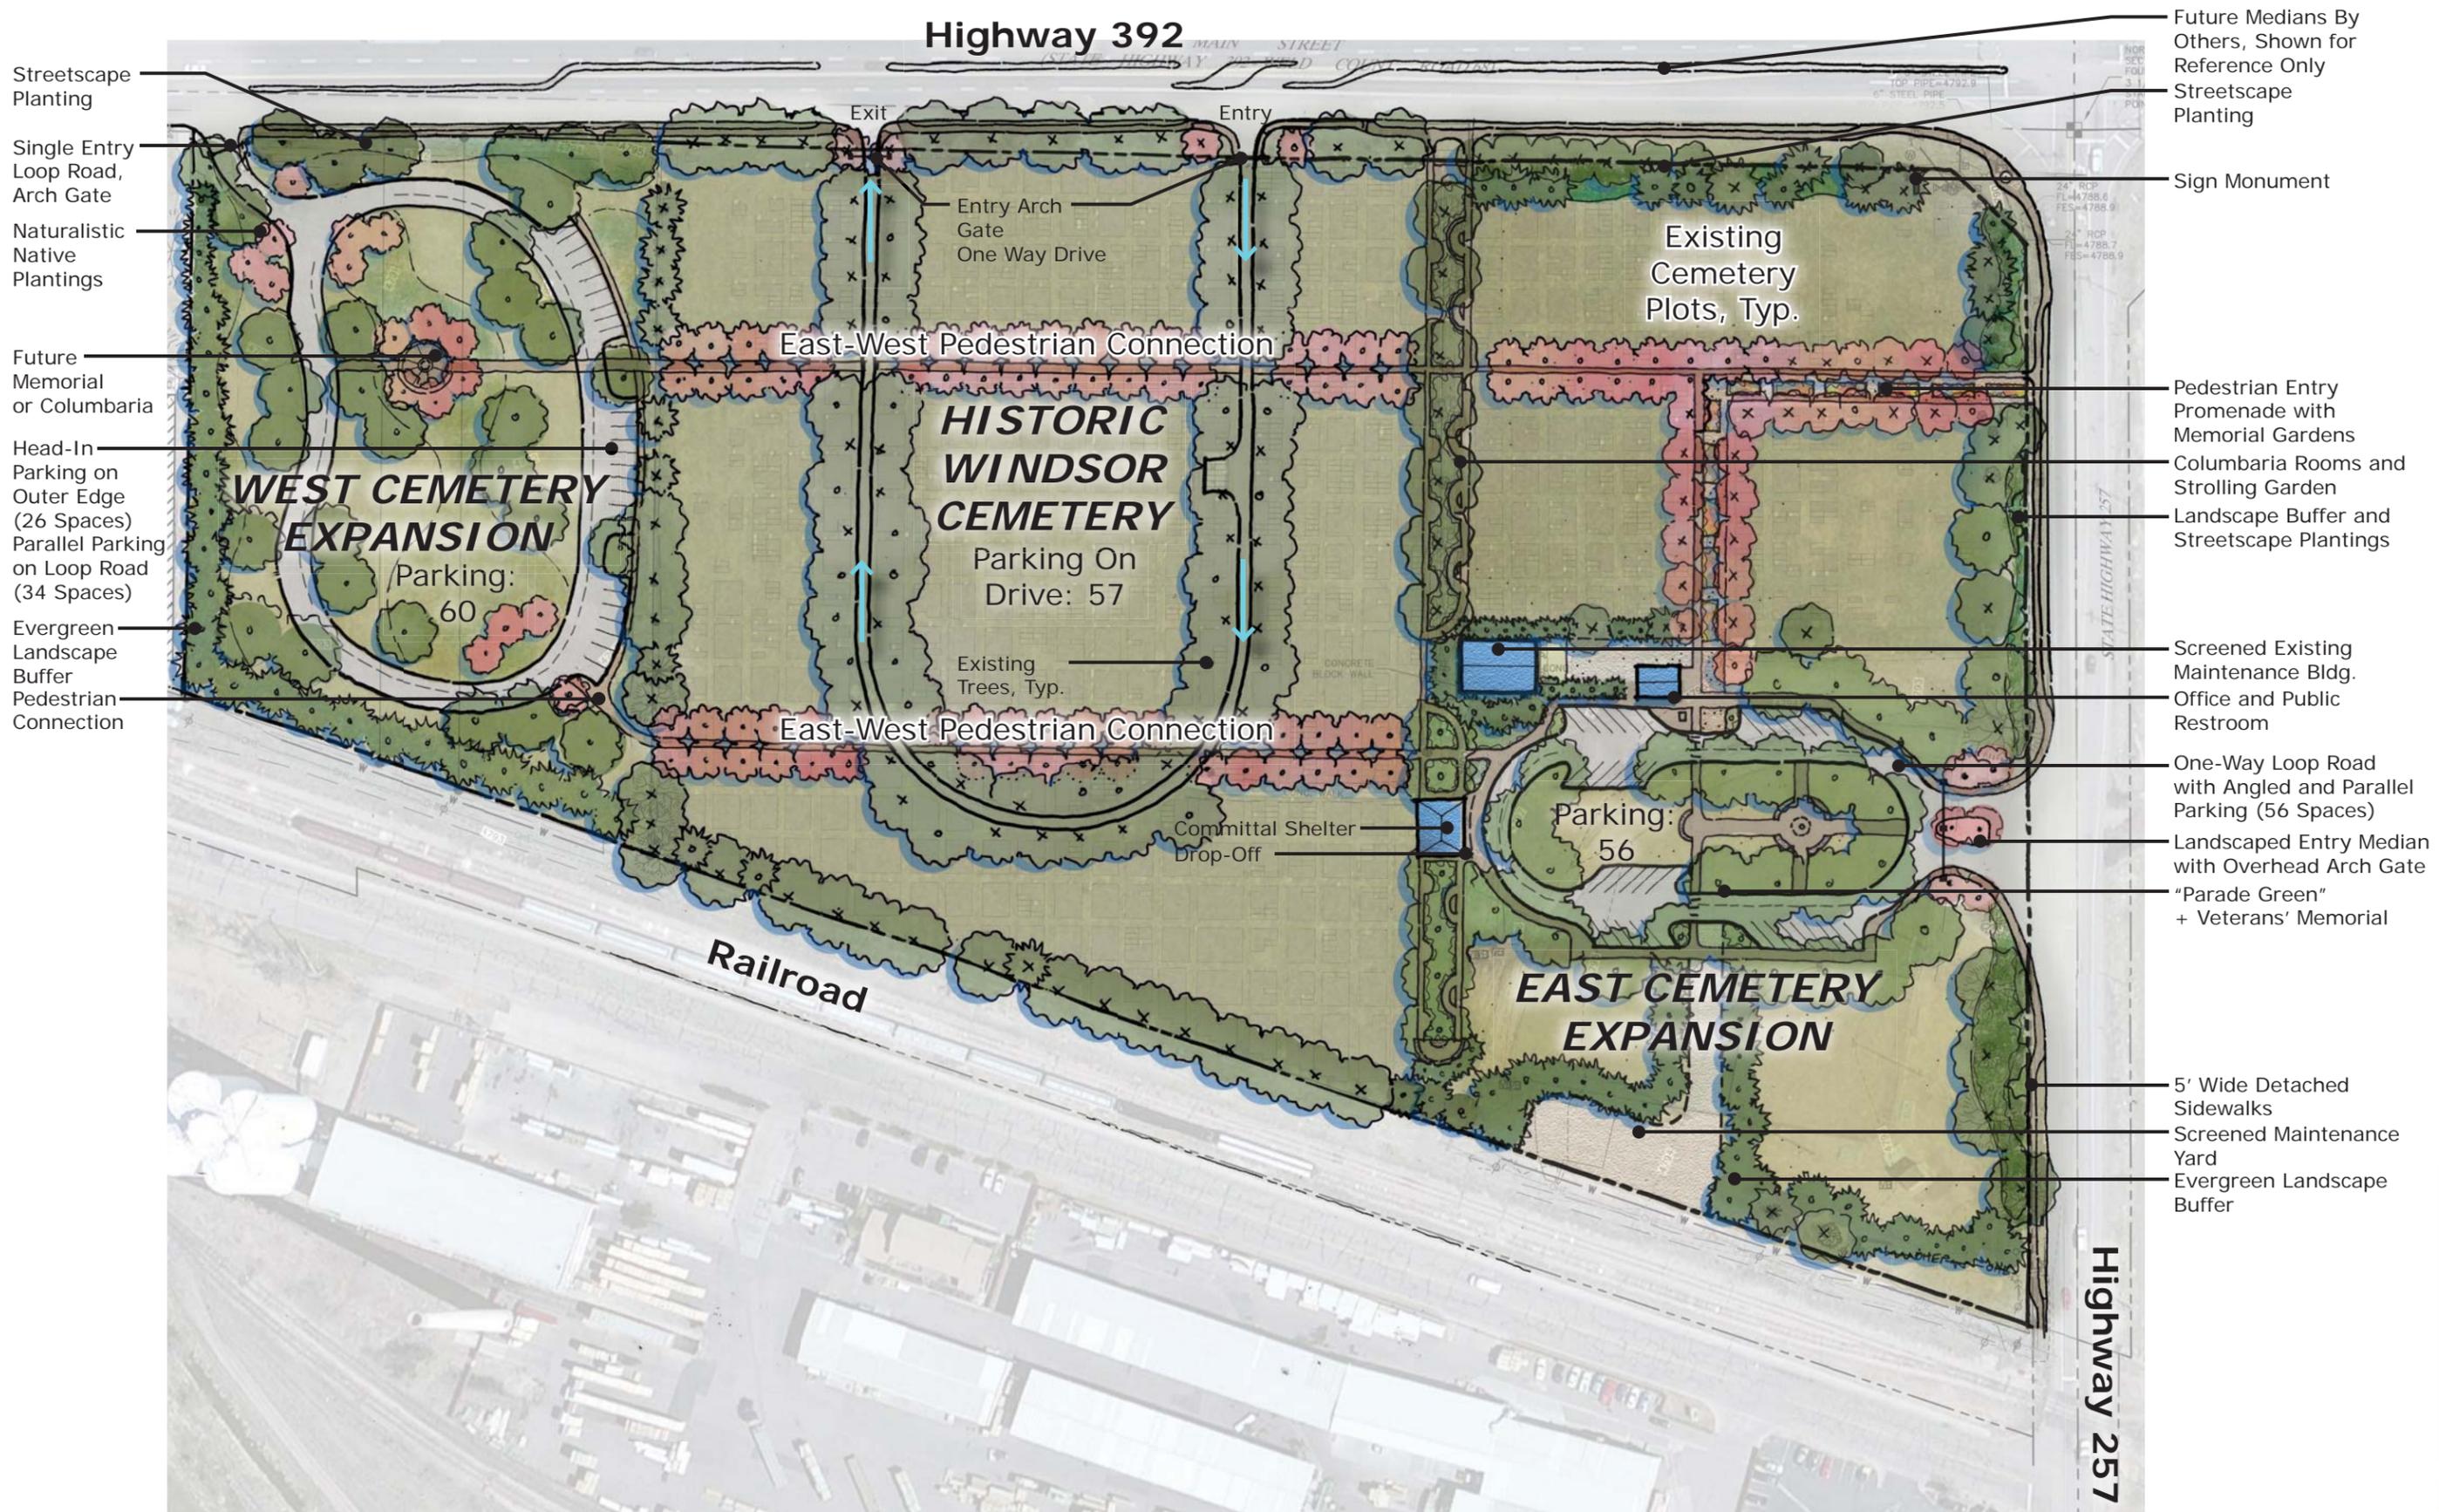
, the 2013 Lakeview Master Plan shows the proposed site elements. The following section of this report will briefly describe each element's design intent. The images provided in this section are examples to illustrate the character and quality of elements described in the plans. Future design development of the cemetery should consider the following qualities in material selection: endurance, regional character, and carefully thought out details.
